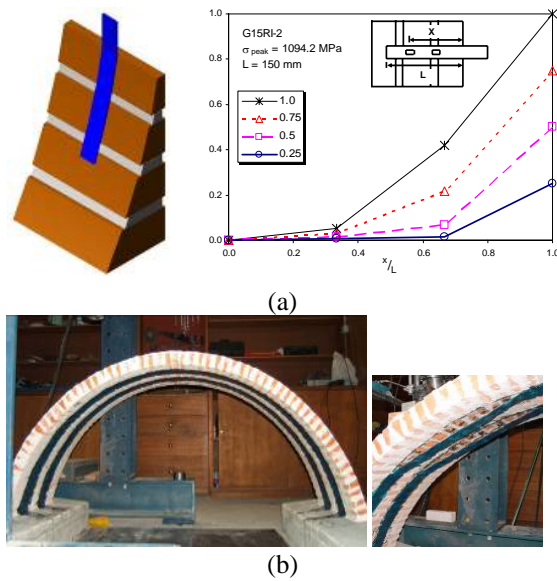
Traditional brick masonry strengthened with FRP: (a) bond tests with different masonry curvatures; (b) arch tests under point load.
